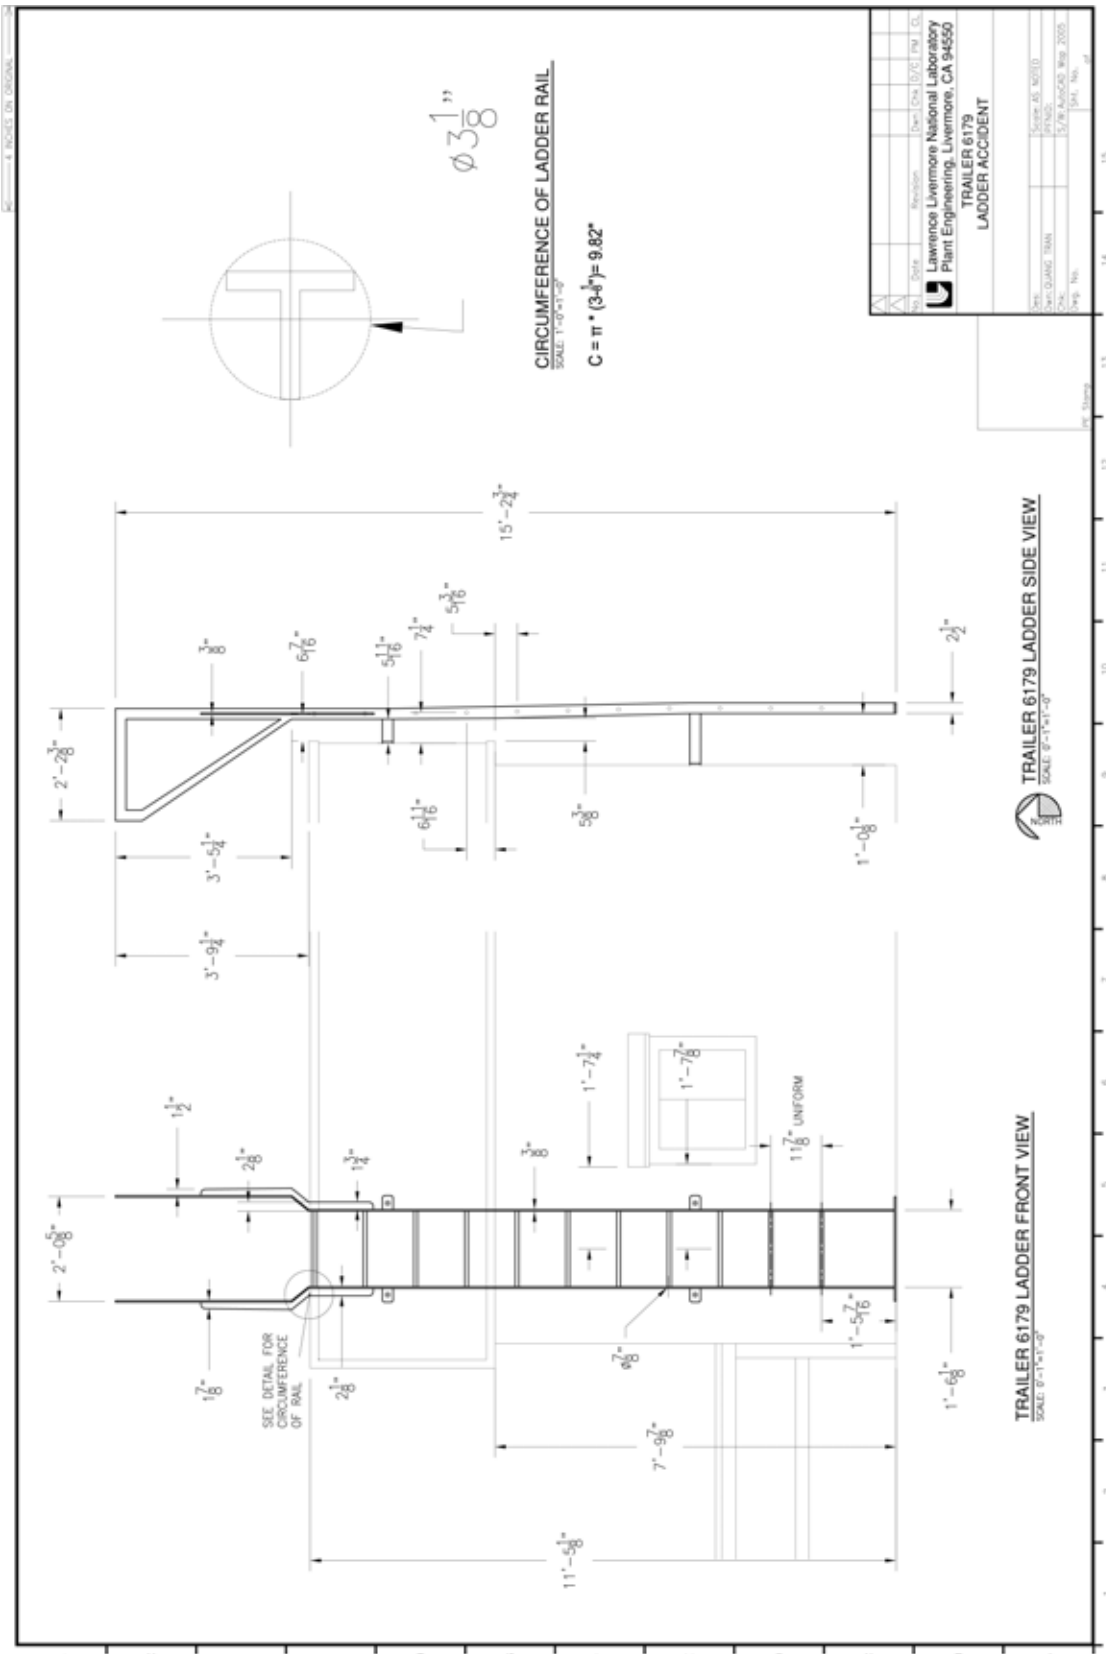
Detailed drawing of the as-found configuration of the fixed ladder mounted to the building.
